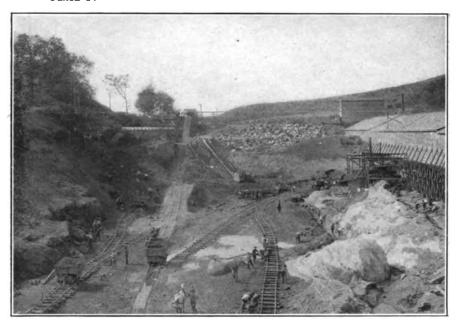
Fig. C.—Wachusett dam site, looking upstream, showing excavation previous to installation of cableways. Large flume at right, small flume at left of incline.
